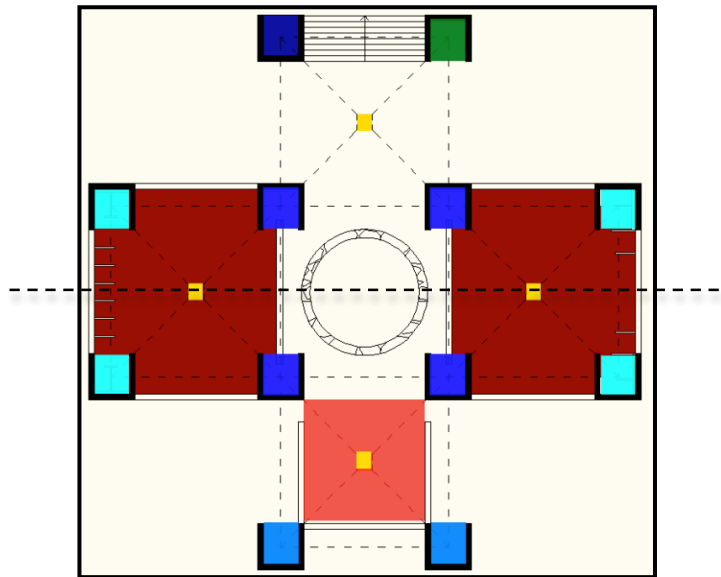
Bathhouse Ground Floor Plan, servant and served spaces (Drawn by Author)
